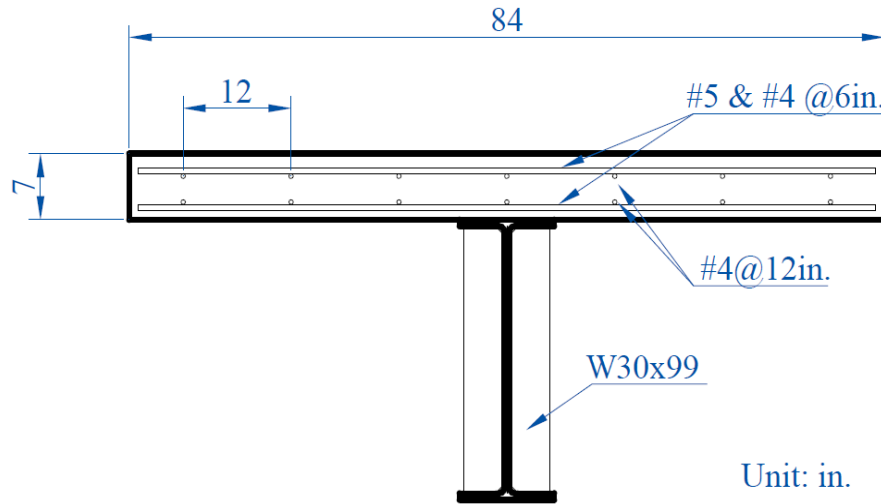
Details of the test specimen. (From Kwon et al. (2008))
